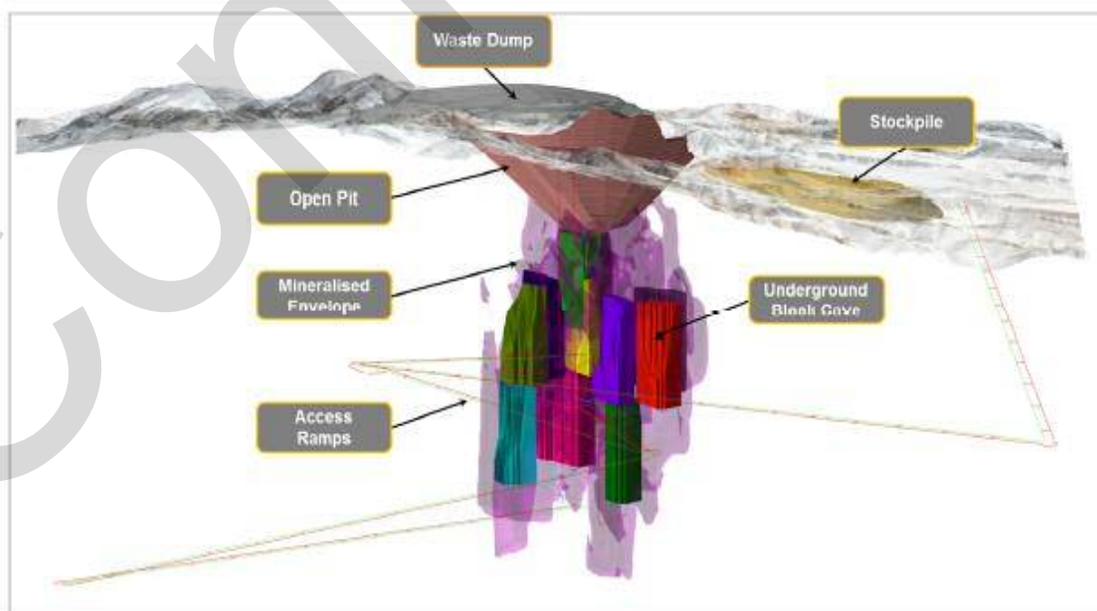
Schematic – Section looking northwest showing the surface DTM, open pit, underground bulk stopes and the mineralised envelope at a 0.35% CuEq cut-off (purple) constraining the bulk stopes
